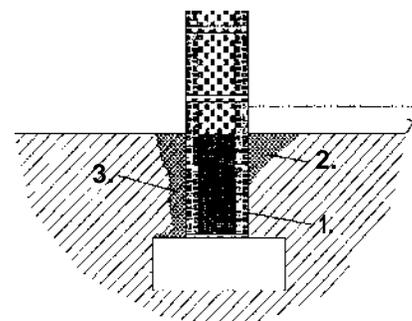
Completed treatment of block foundation—floating slab showing treatment of 1. the voids in the concrete blocks, 2. the soil in the subslab area at the expansion joint, and 3. the soil around the outside perimeter of the building.
